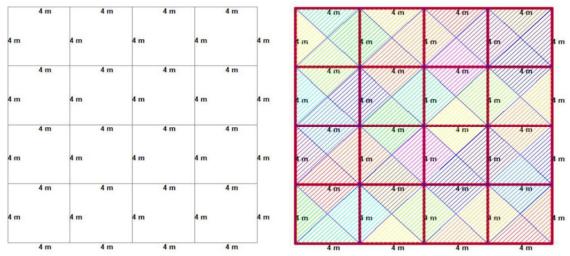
Plan of Building with and without Loading Distribution Generated in STAAD Pro
